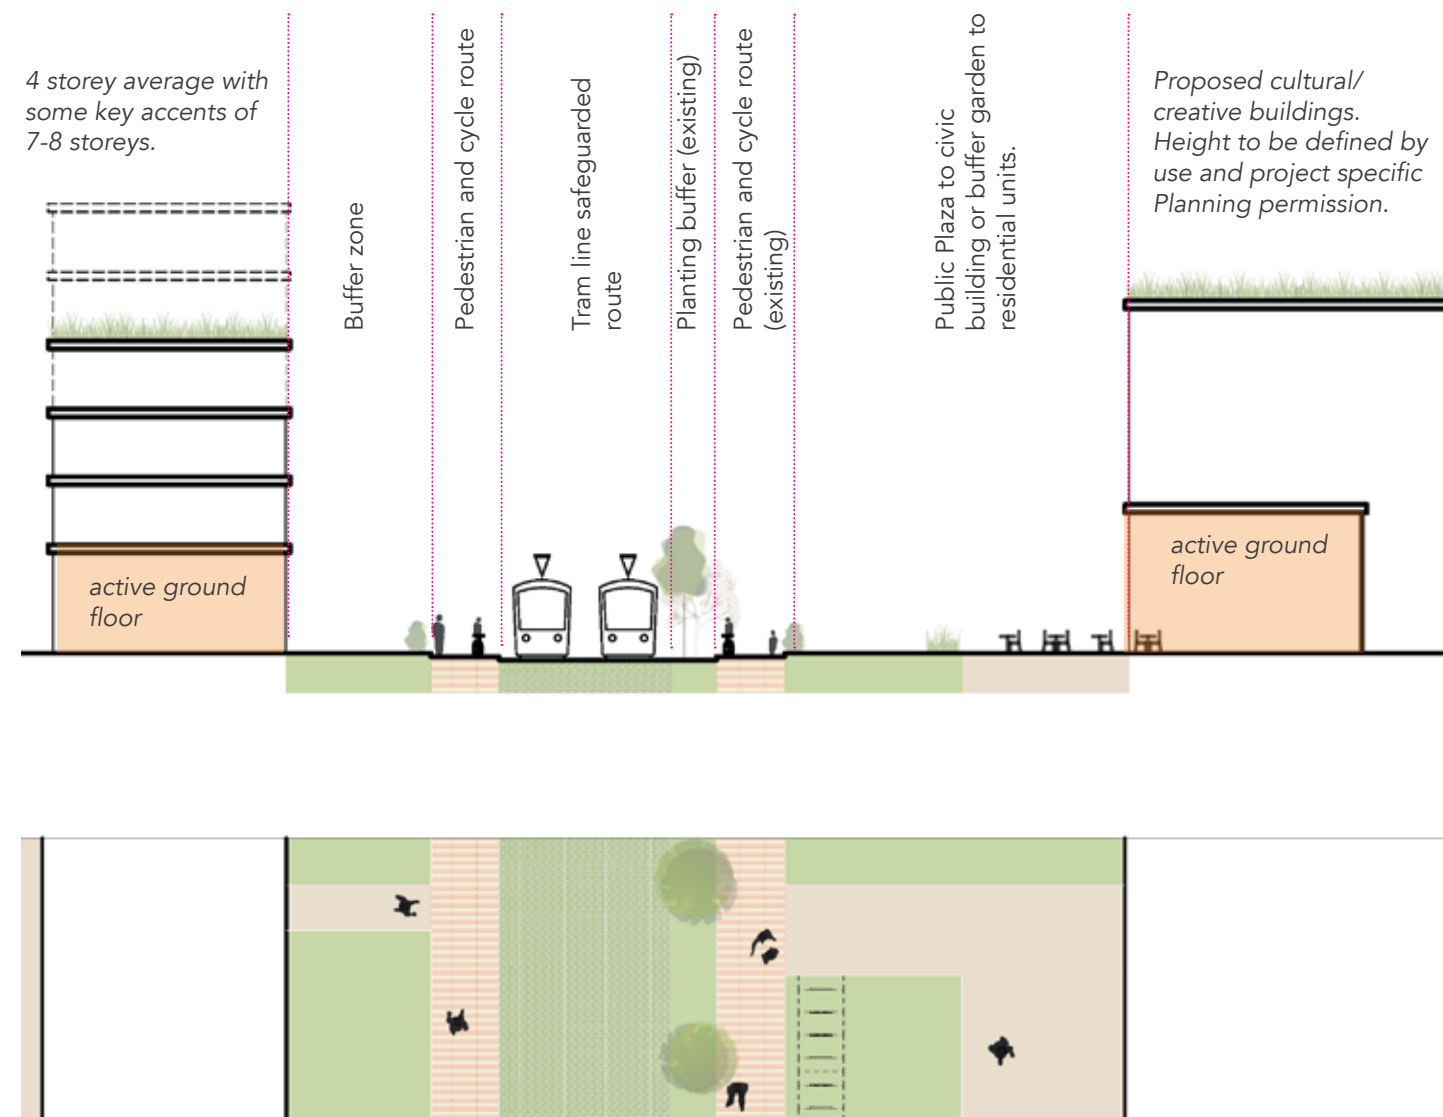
Illustrative section and plan for the Diagonal Route
